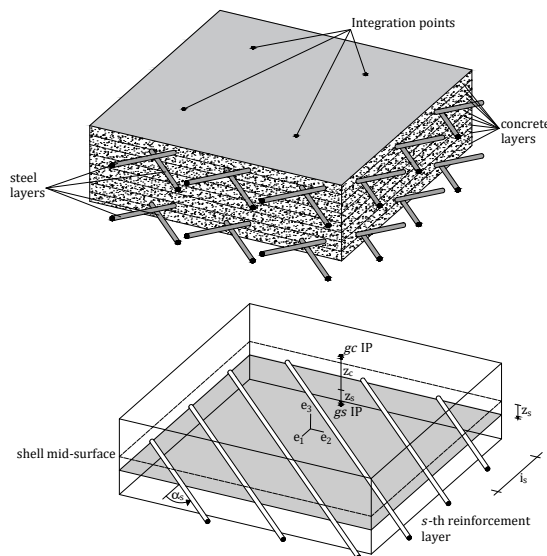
Layered reinforced concrete shell with four reinforcing layers (left-hand side) and detail of single steel and concrete IPs (right-hand side).
